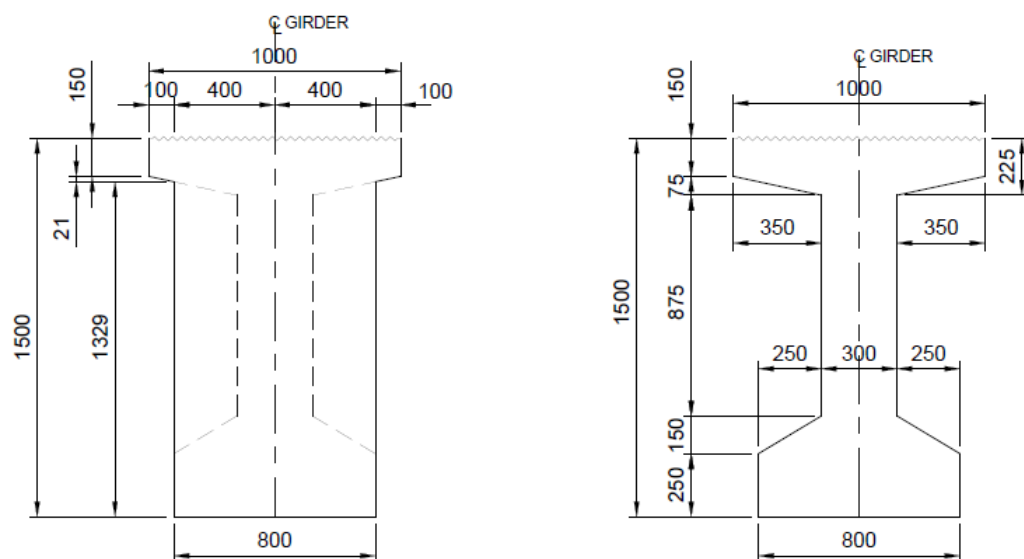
4 Girder section of 25m span OC post tensioned I girder at support and mid span
